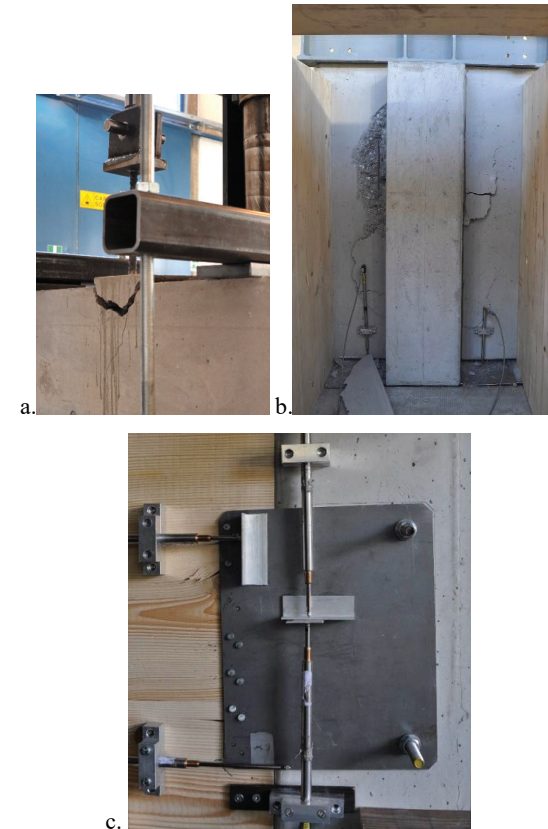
Failure modes: a) tensile test; b) beam-to-slab connection shear test; c) panel-to-beam connection shear test
